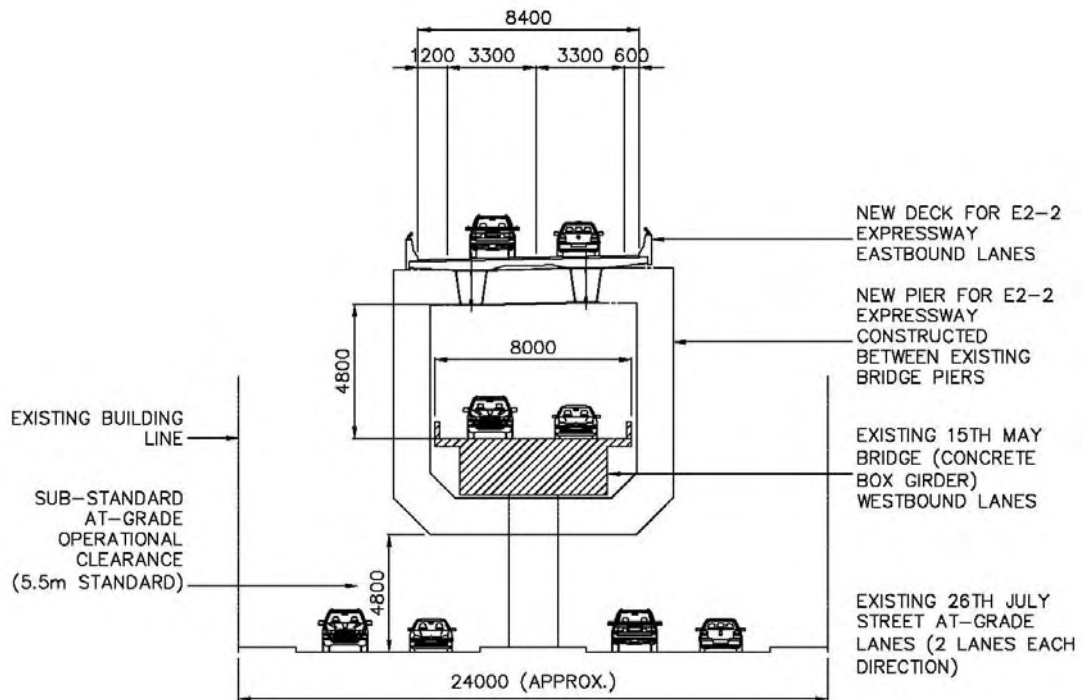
DRAFT Section at Sta. 0+300: E2-2
